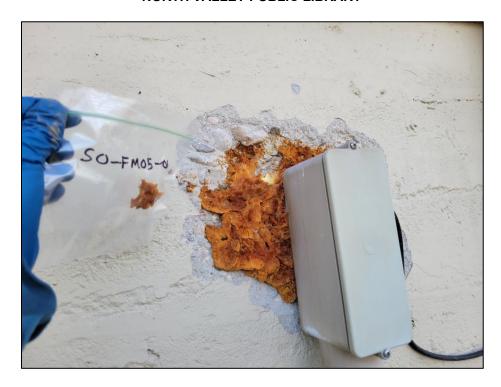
FM05: Orange foam on exterior wall outside of staff/kitchen room
